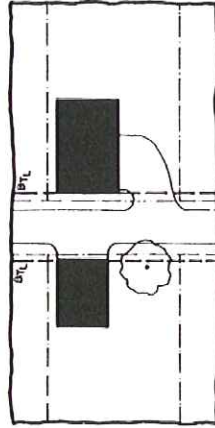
Typical alley section with side loaded and rear loaded private garages (Source: Nelessen , 212)
